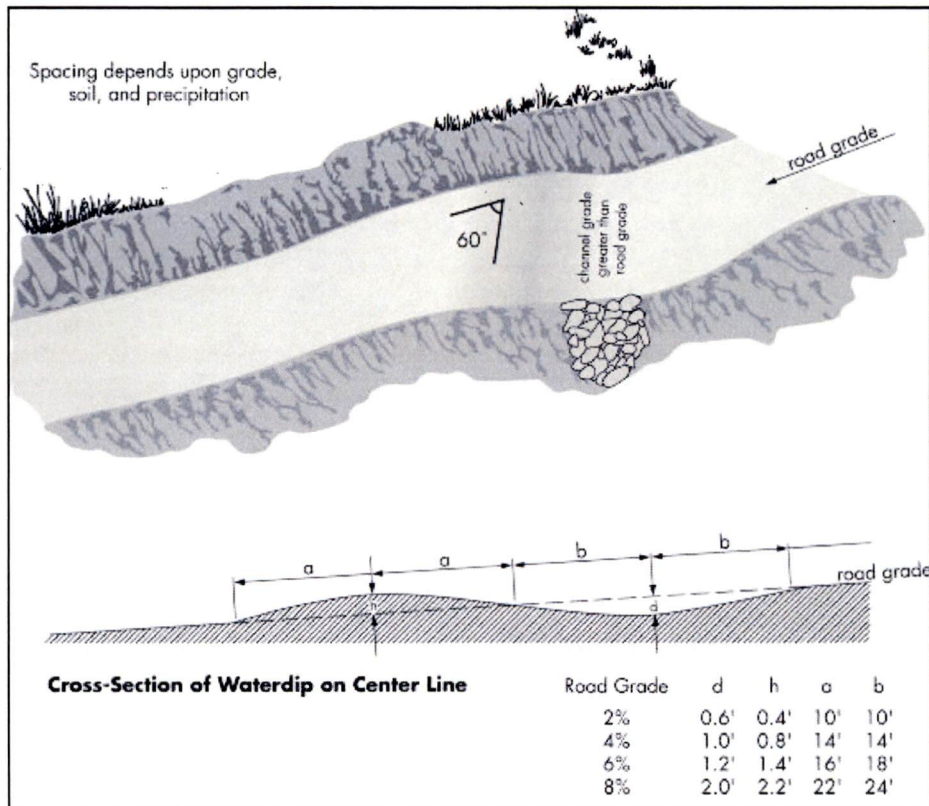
Plan and Cross-Section Views - Road Drainage Dip.
